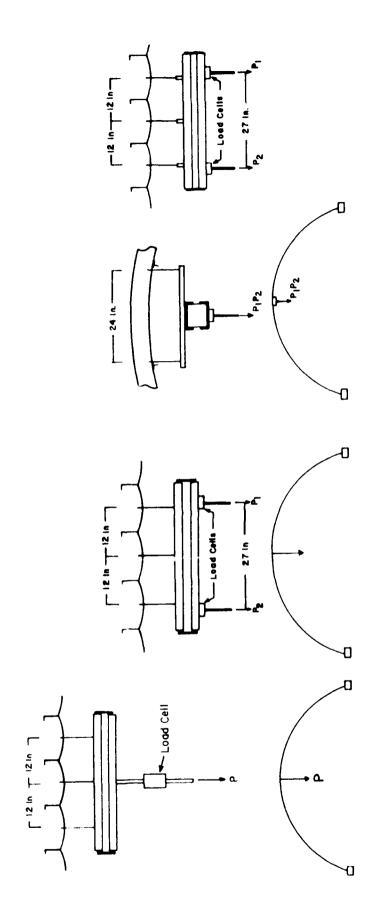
Test configurations for full arch tests (a) 1, (b) 2, and (c) 3.
